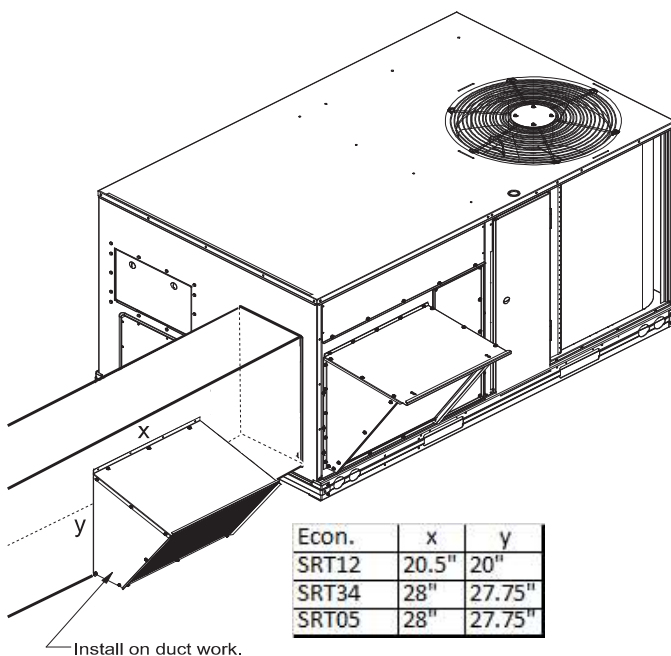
Relief Damper/Hood Assembly Installation Location
